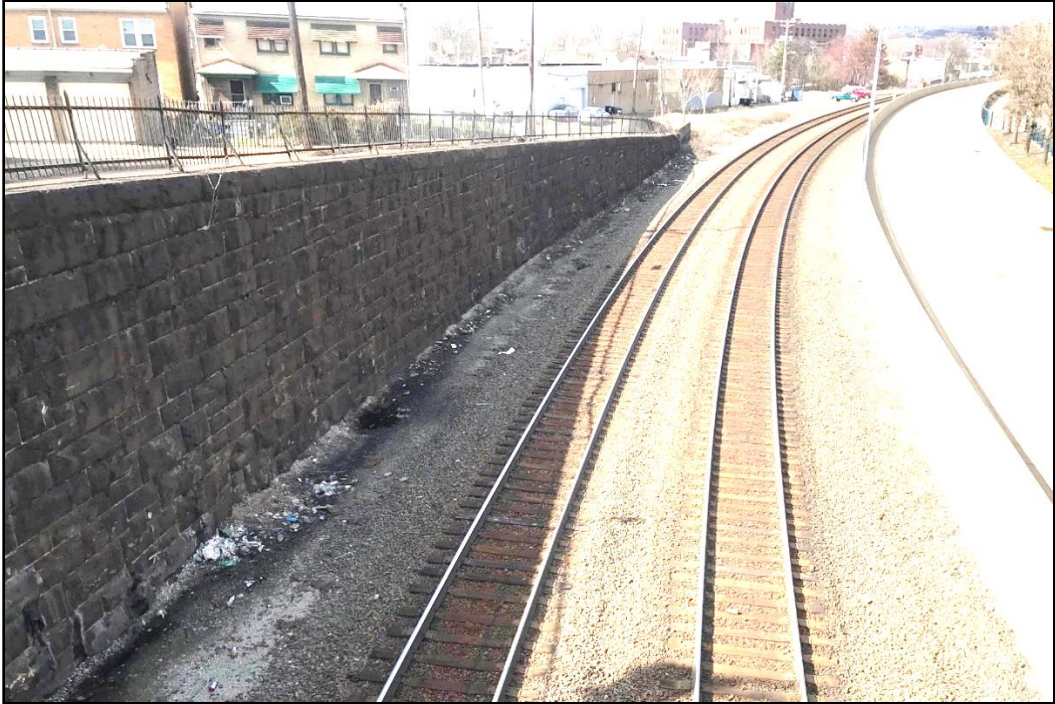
Detail of stone retaining wall and wrought-iron fencing of the Palmer Street north approach ramp from Washington Avenue Bridge, facing north.
